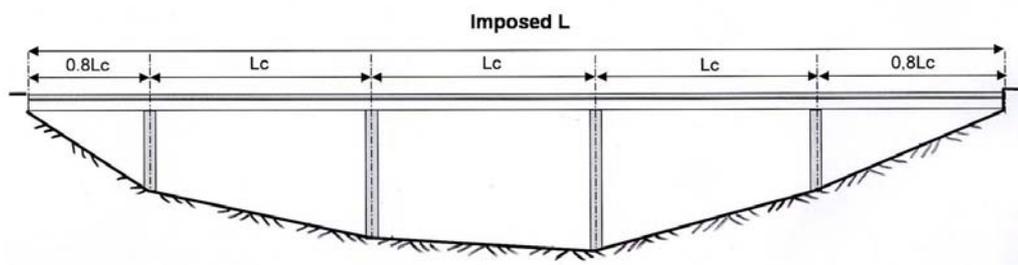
Bridge with imposed abutment positions and “long” end spans
